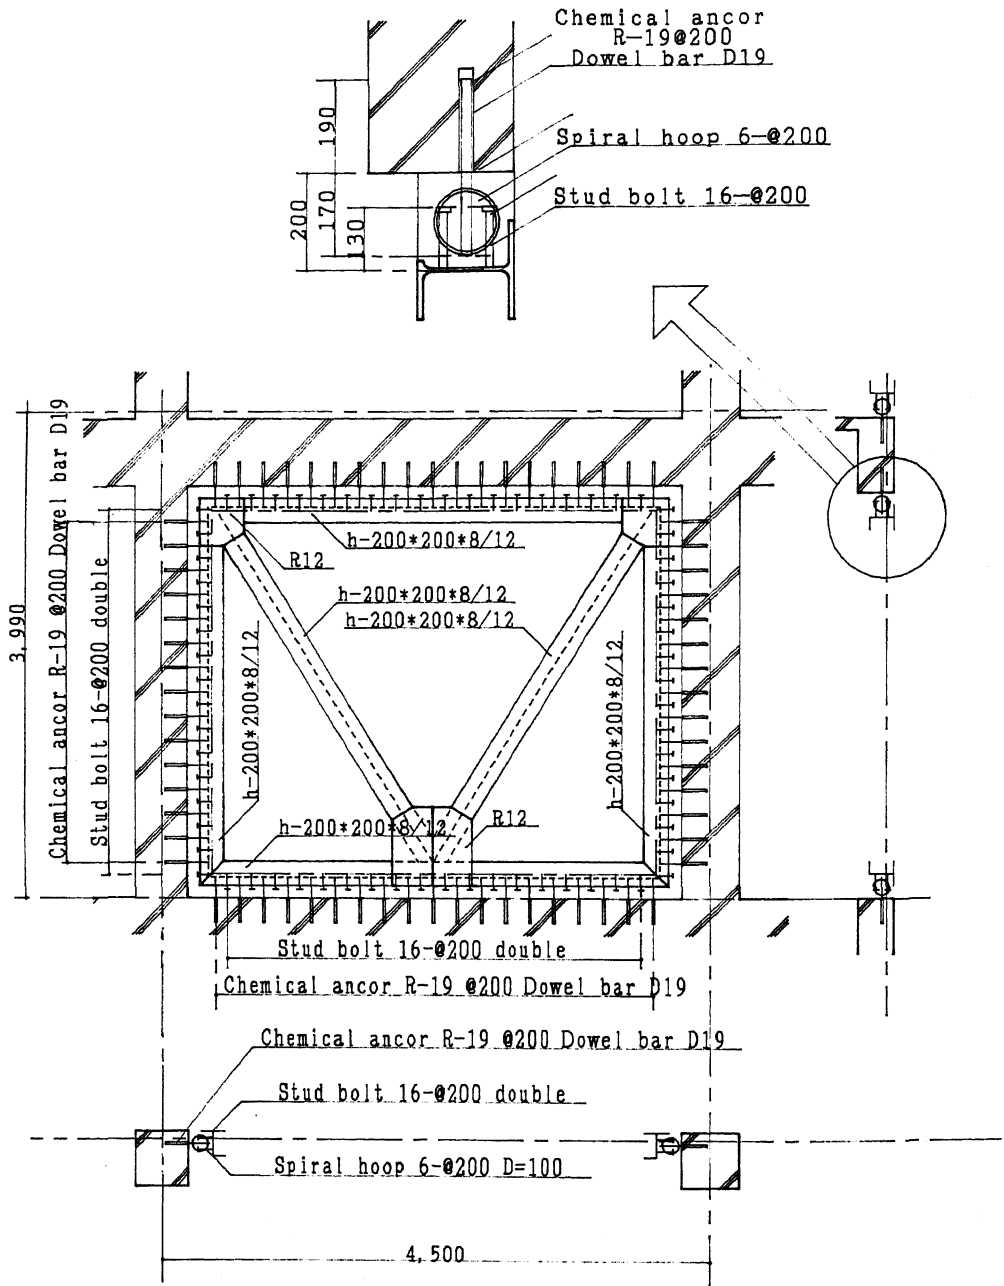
Details in The Connection of The Additional Steel Braced Frames to The Existing Frames
